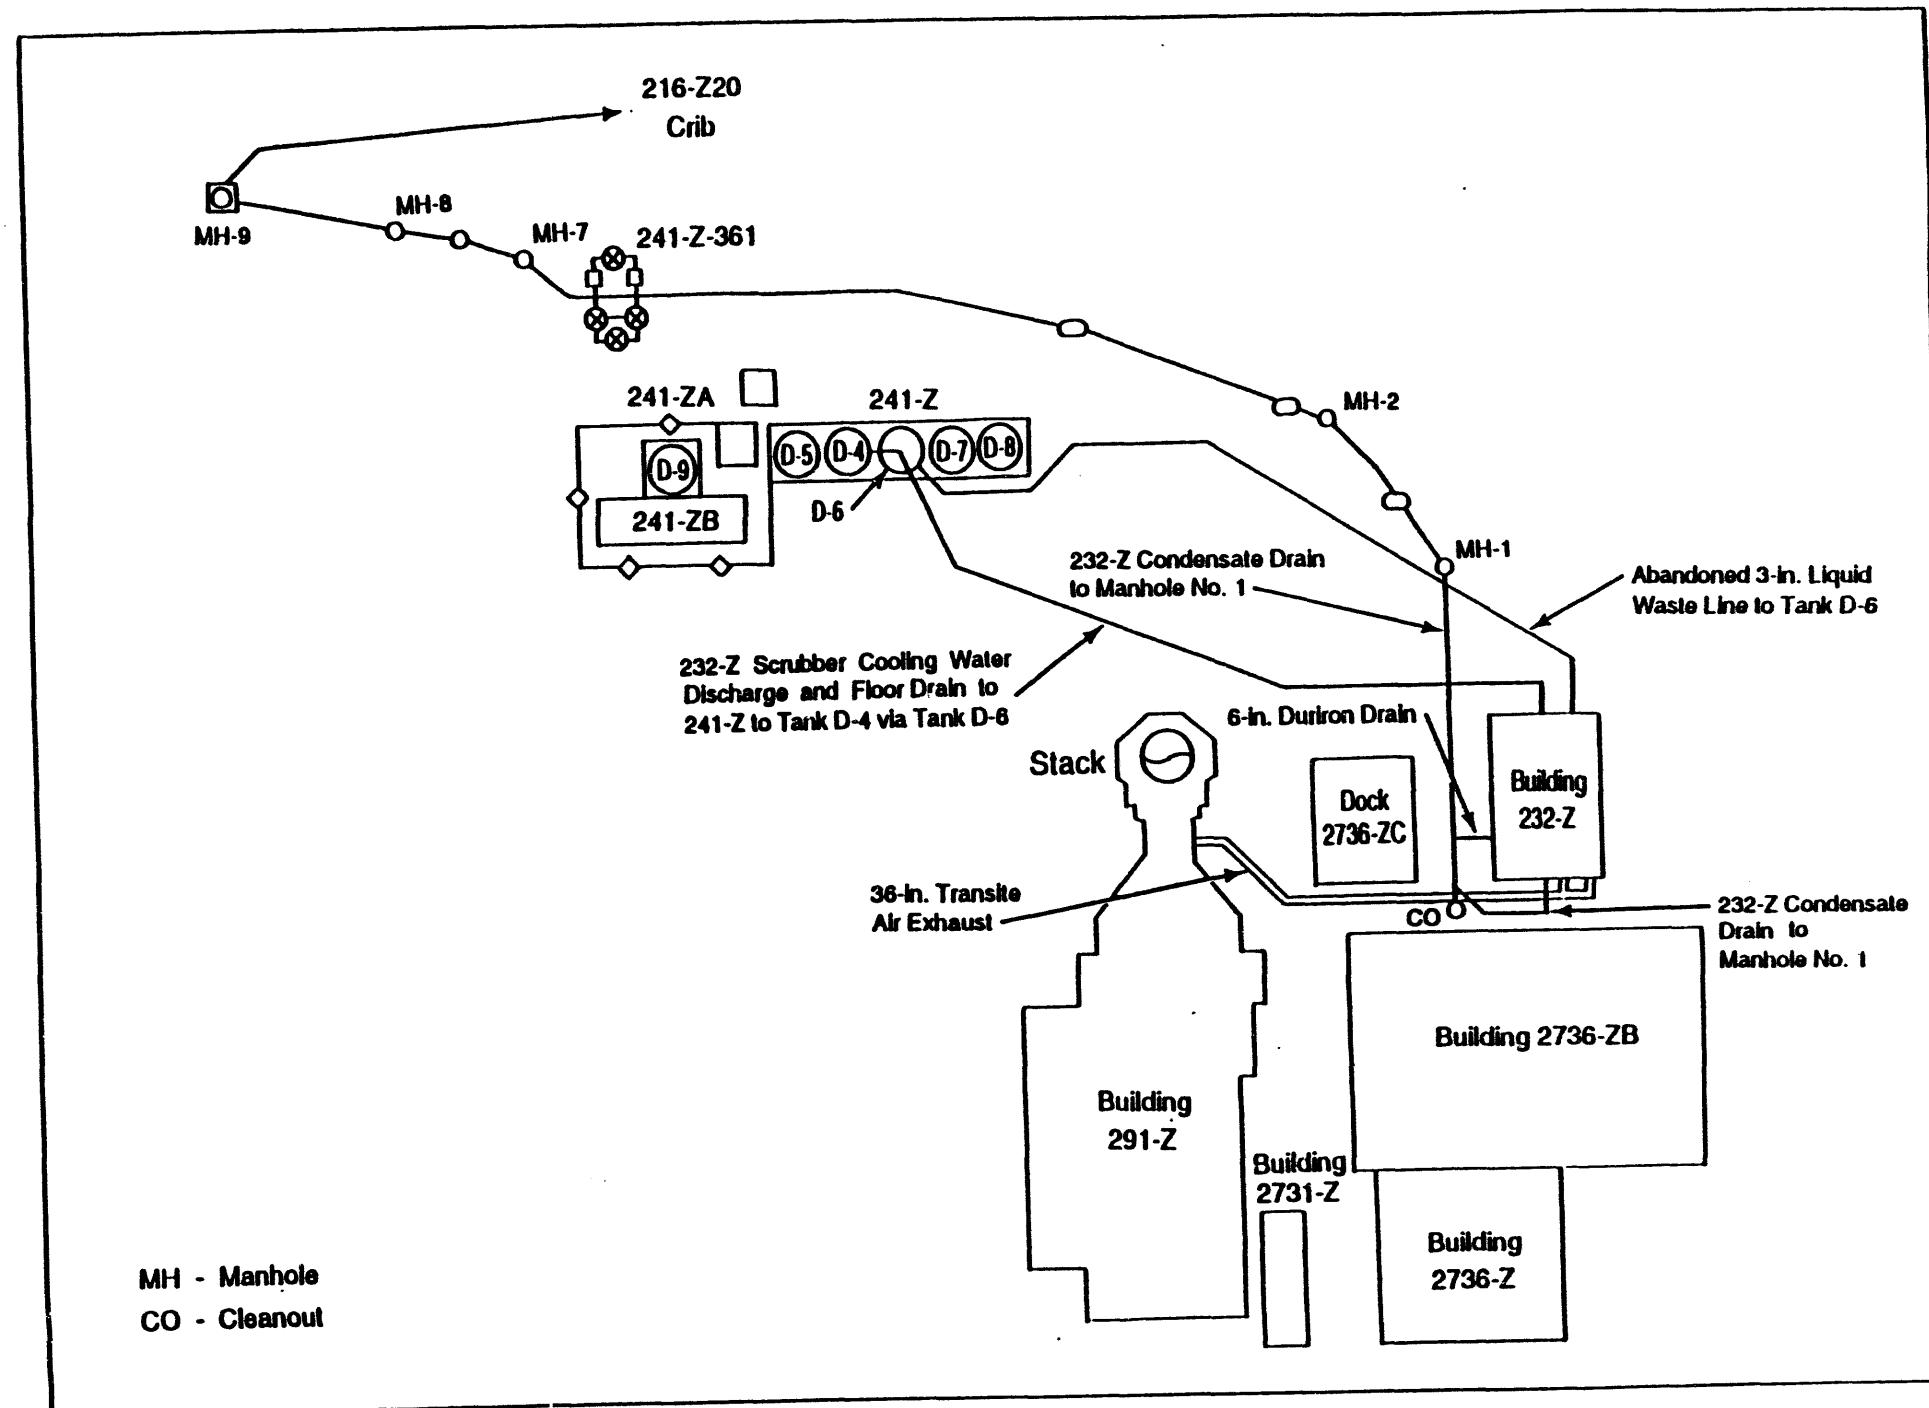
LIQUID WASTE LINES AND EXHAUST DUCT EXITING BUILDING 232-Z
